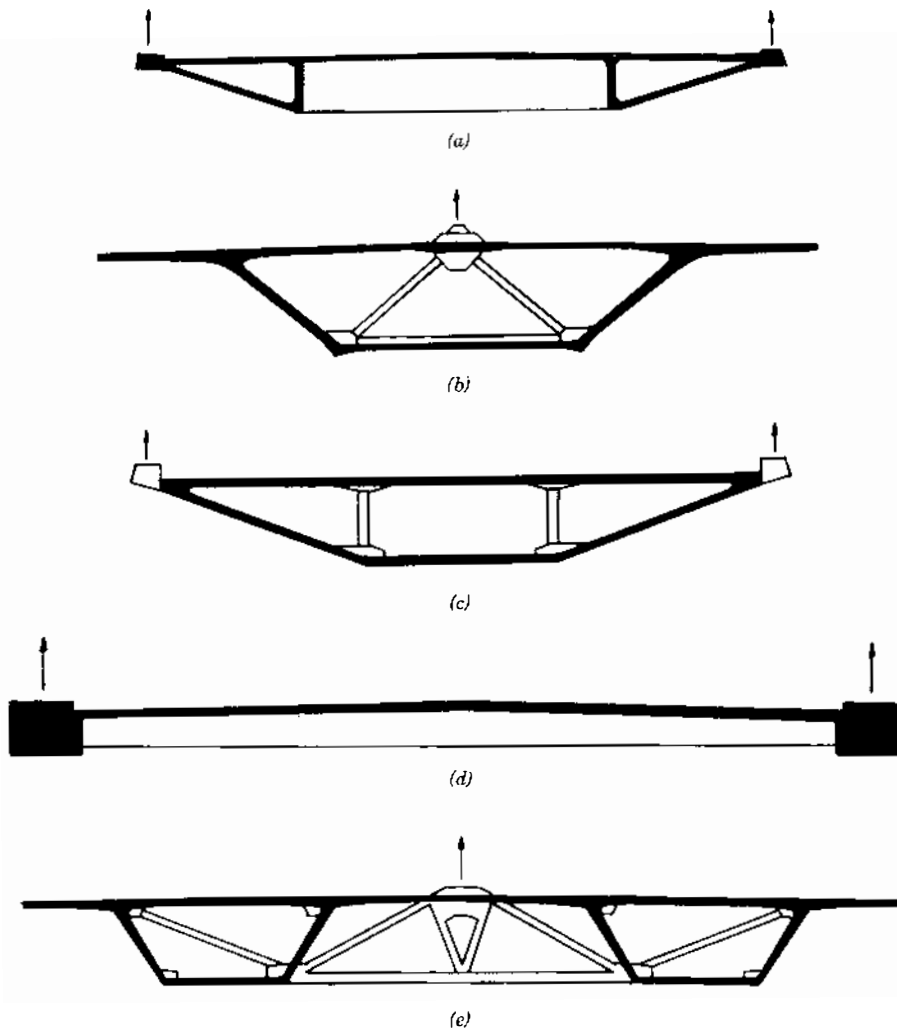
Composite superstructure girders of cable-stay bridges: (a) James River isometric, (b) East Huntington cross section.
